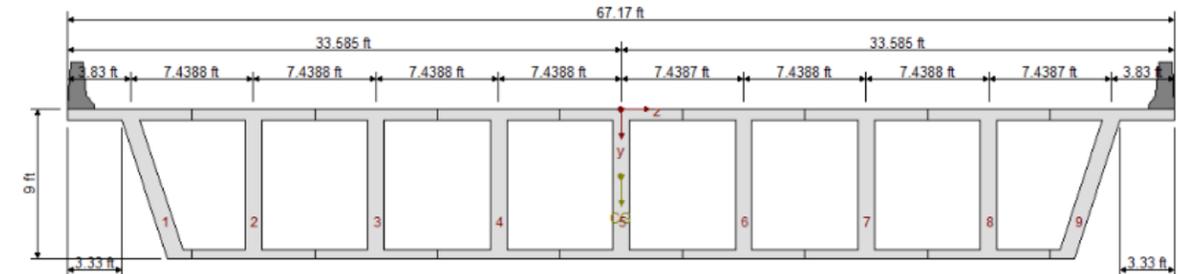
Ramp SE-NE, Bridge Typical Section
